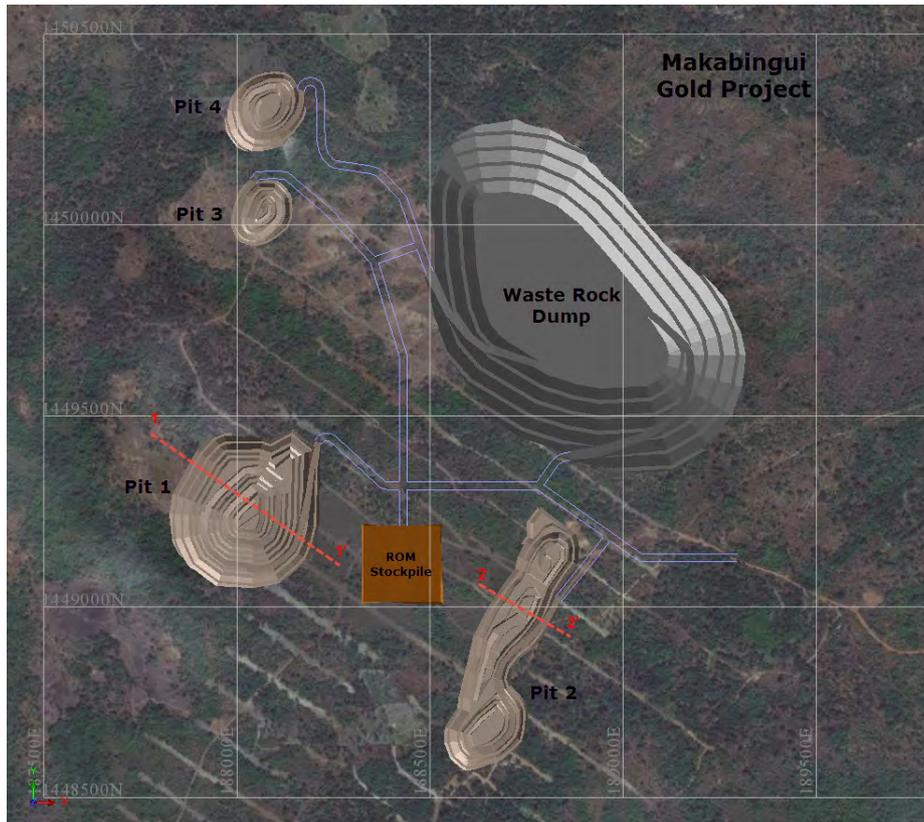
Mine Plan View Showing Pits and Waste Dump
